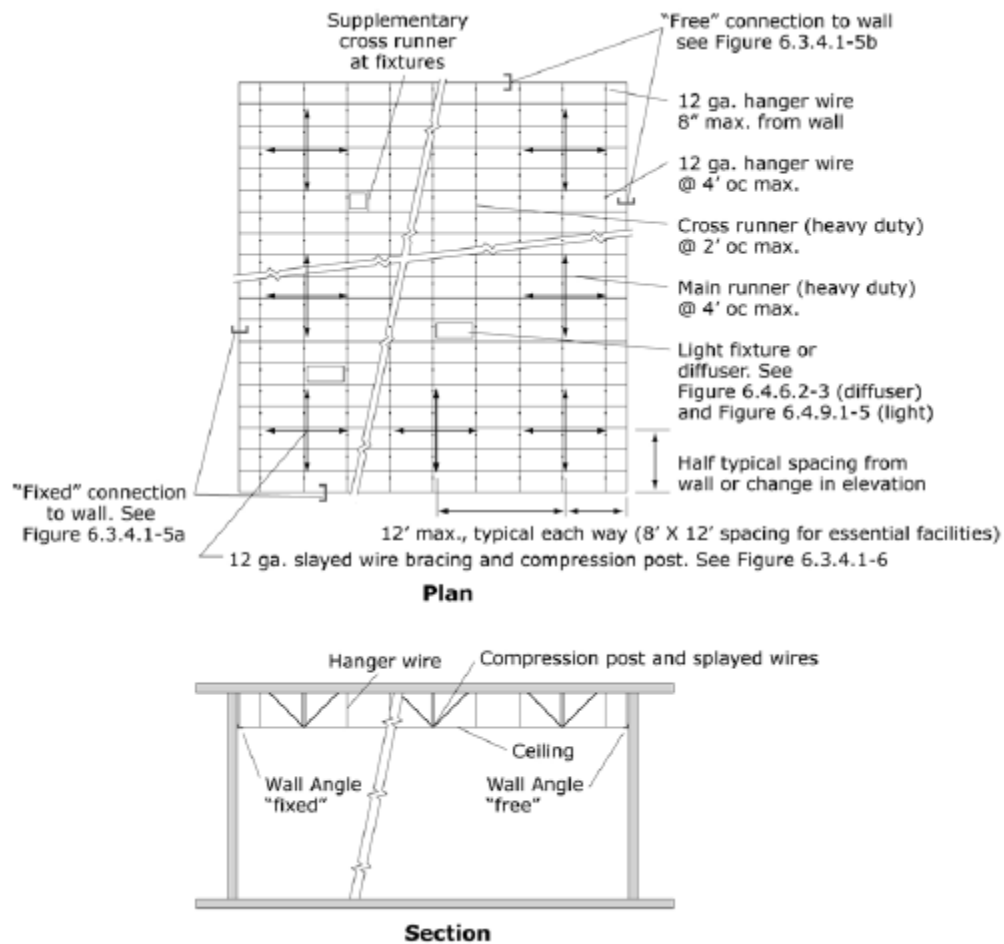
Suspension System for Acoustic Lay-in Panel Ceilings – General Bracing Layout.
